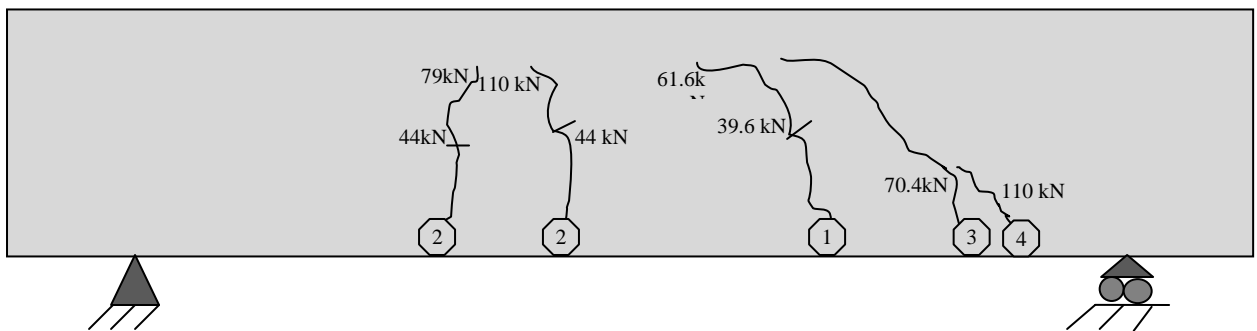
Final crack patterns for 1.5% bamboo reinforced beam
